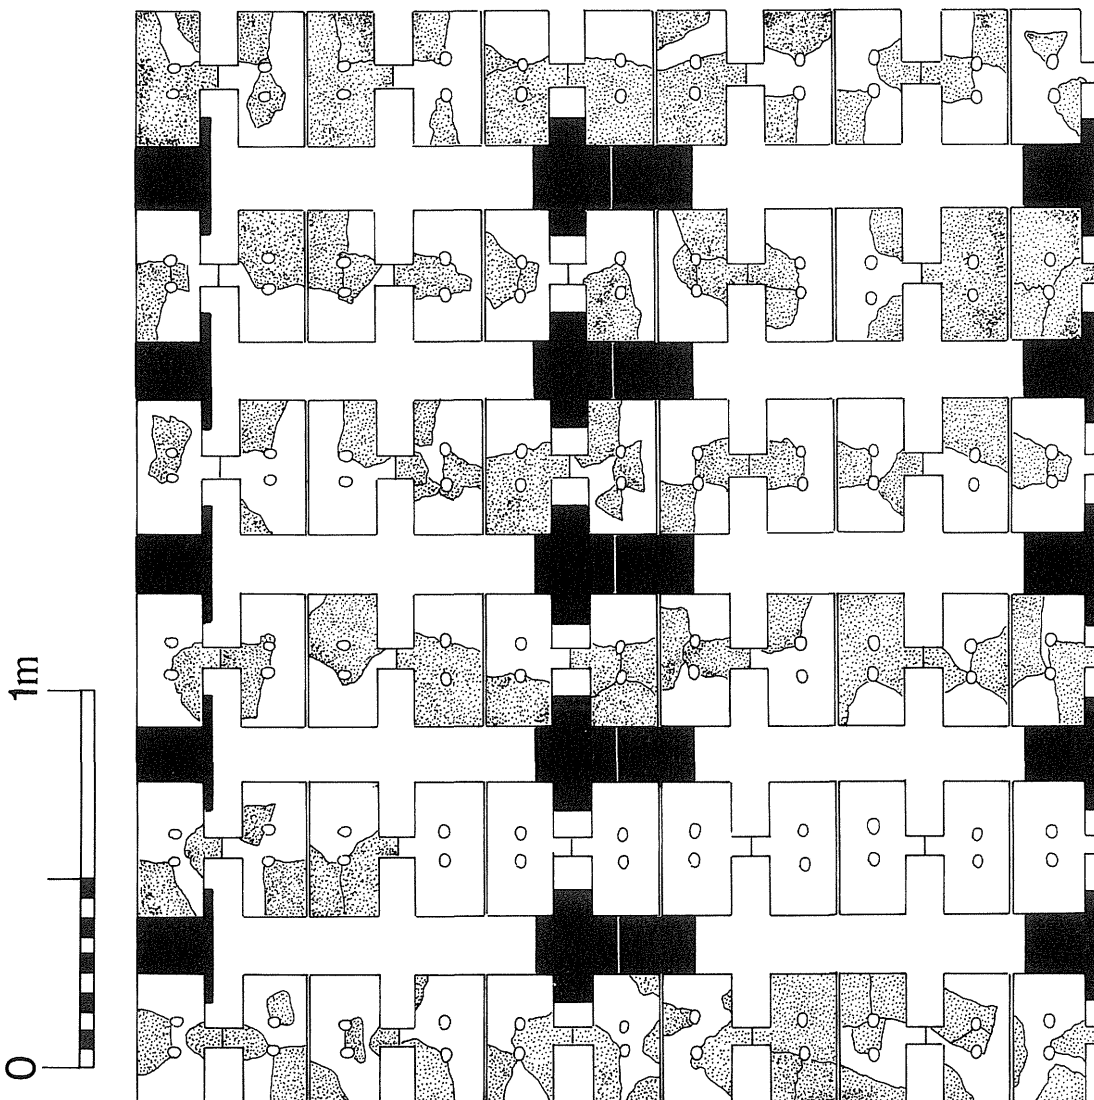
A suggested scheme for the layout of the oven-floor tiles.
